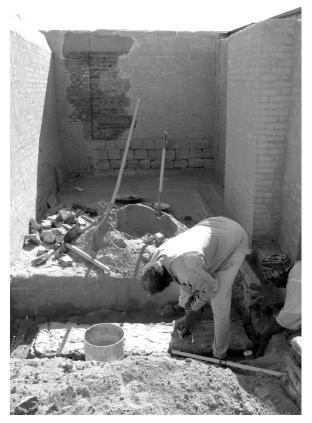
Construction of the new outlet channel for the drainage of the site museum; note the re-modeled, though still unplastered area of the crack in the enclosure wall in the rear (photo: Claudia Näser)
